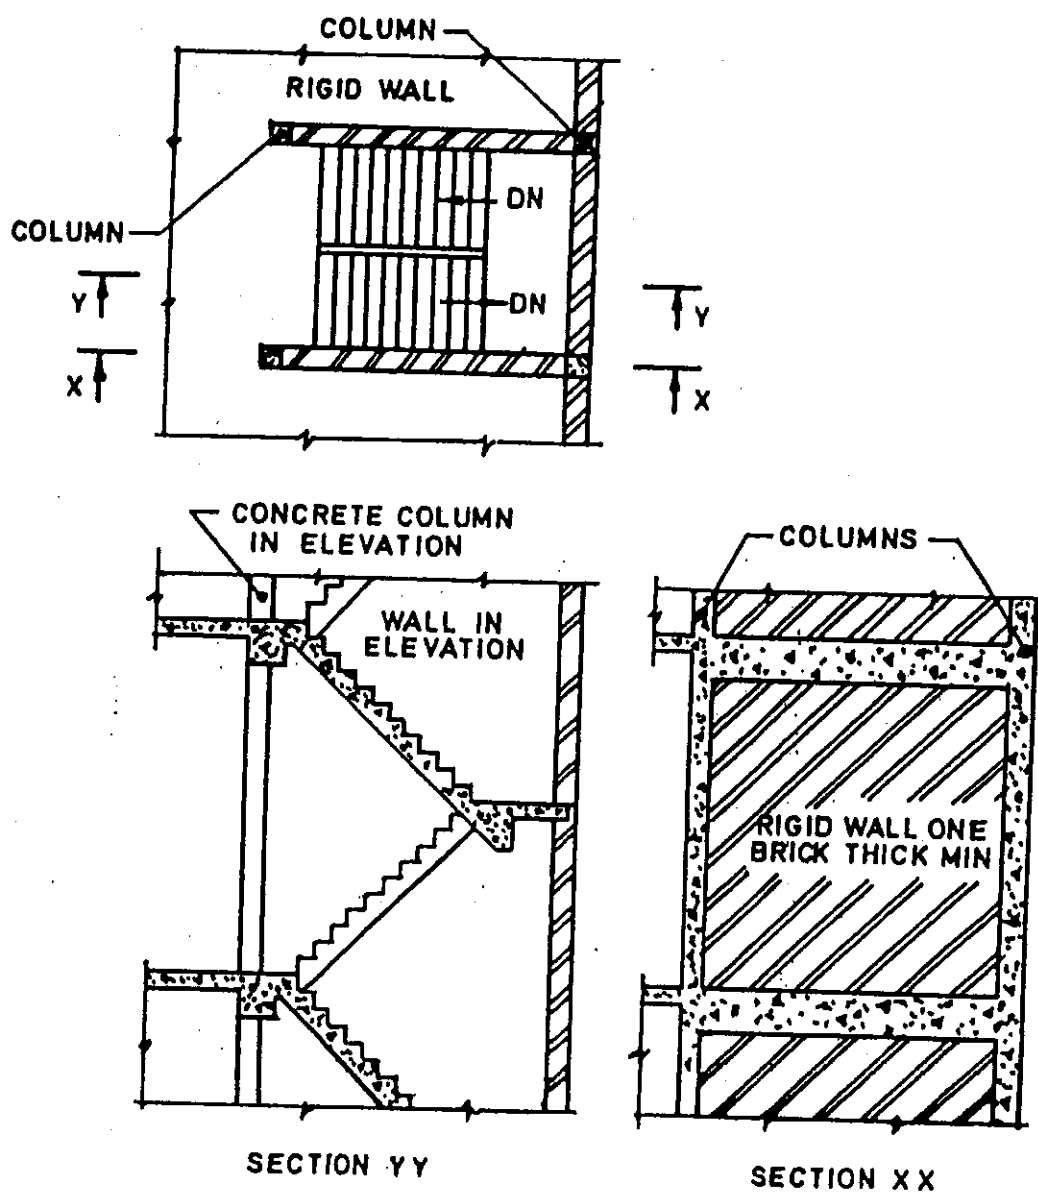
RIGIDLY BUILD-IN STAIR CASE
